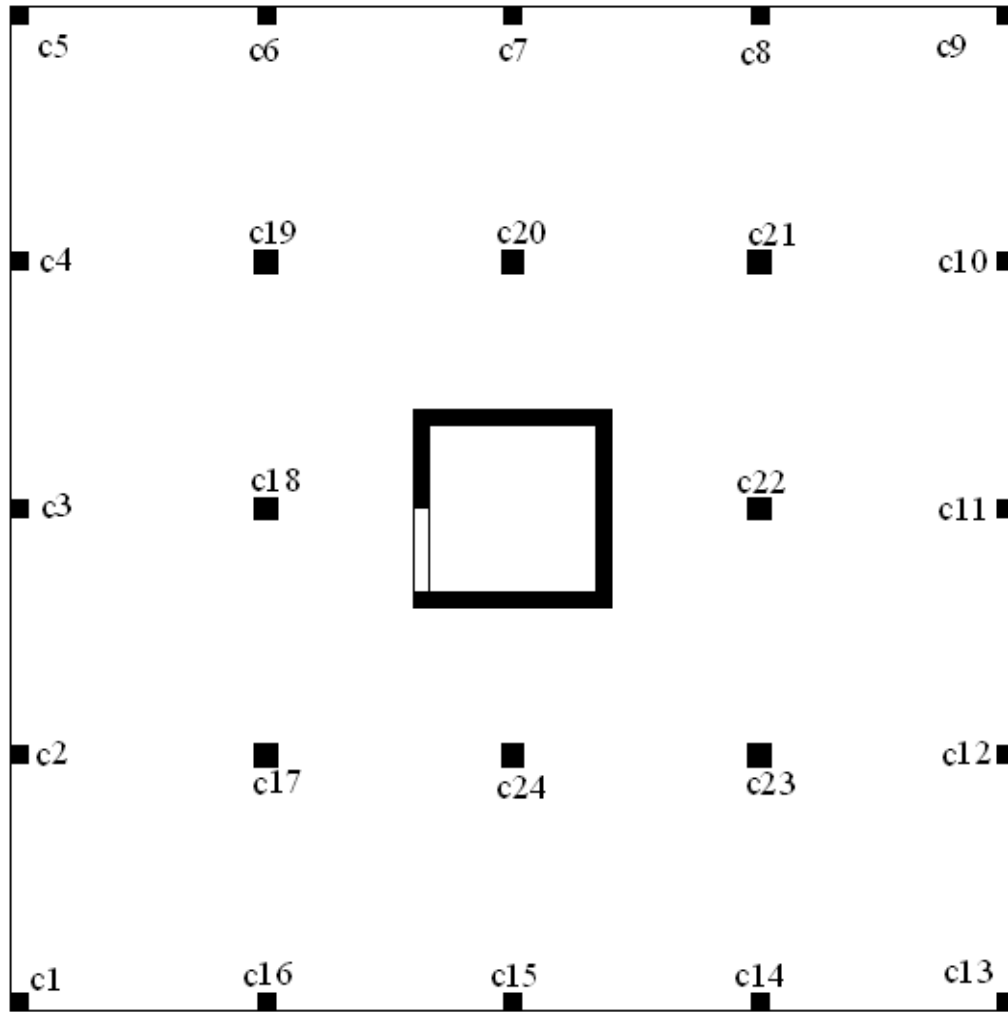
Layout of columns in 5-, 10-, and 20-story R/C buildings
